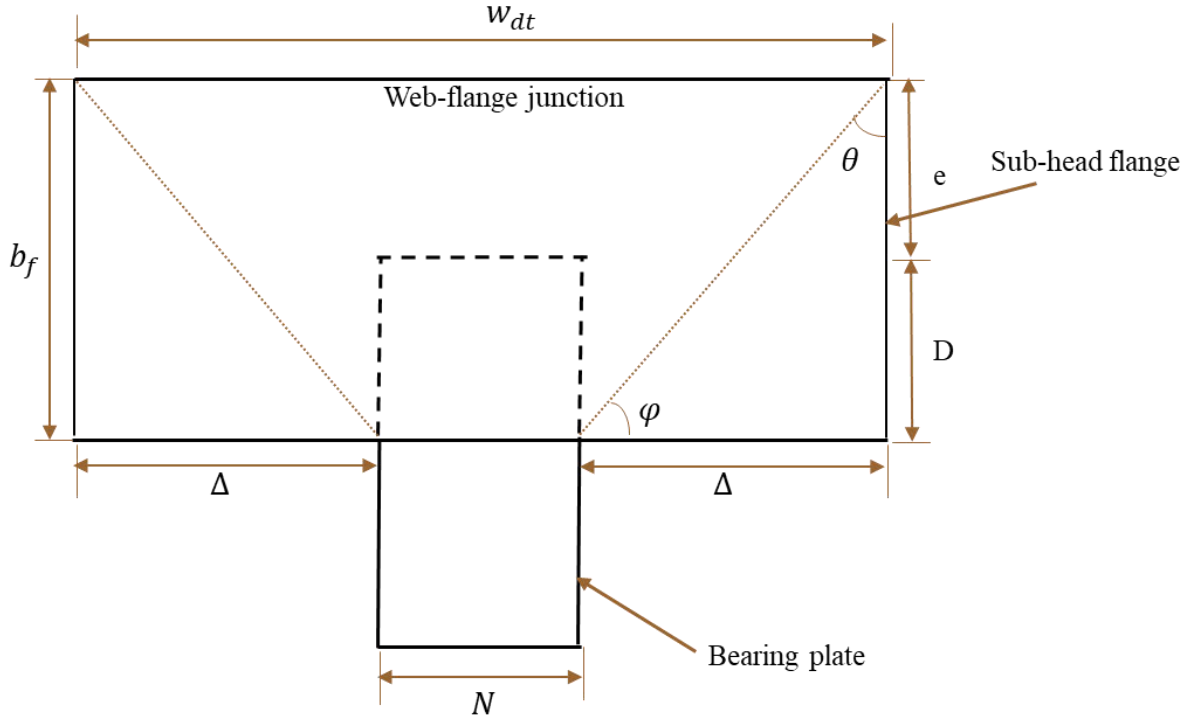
Failure pattern for the sub-head flange.
